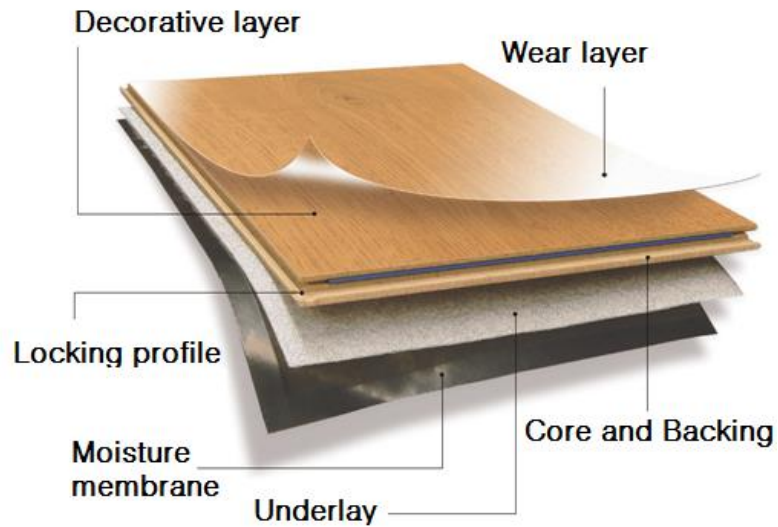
Laminate flooring (Prestige floors n.d.)
